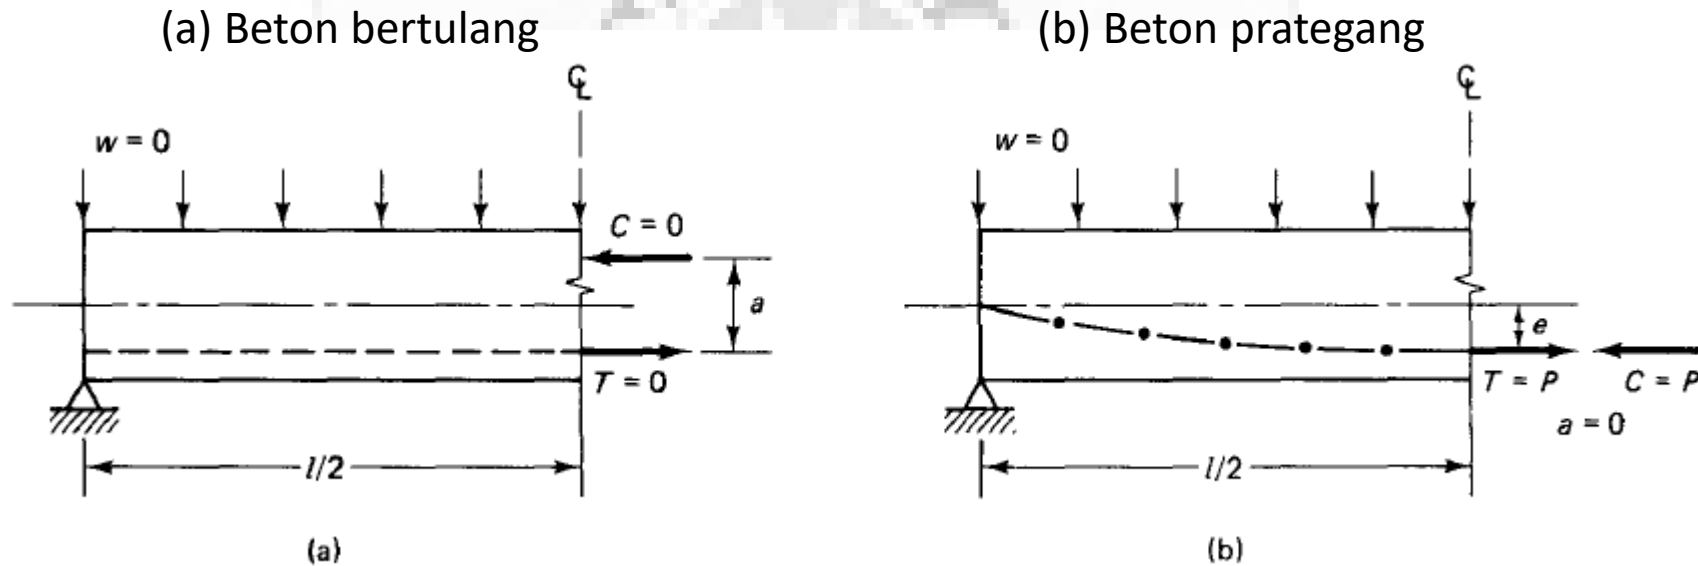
Comparative free-body diagrams of a reinforced concrete (R.C.) beam and a prestressed concrete (P.C.) beam. (a) R.C. beam with no load. (b) P.C. beam with no load.
